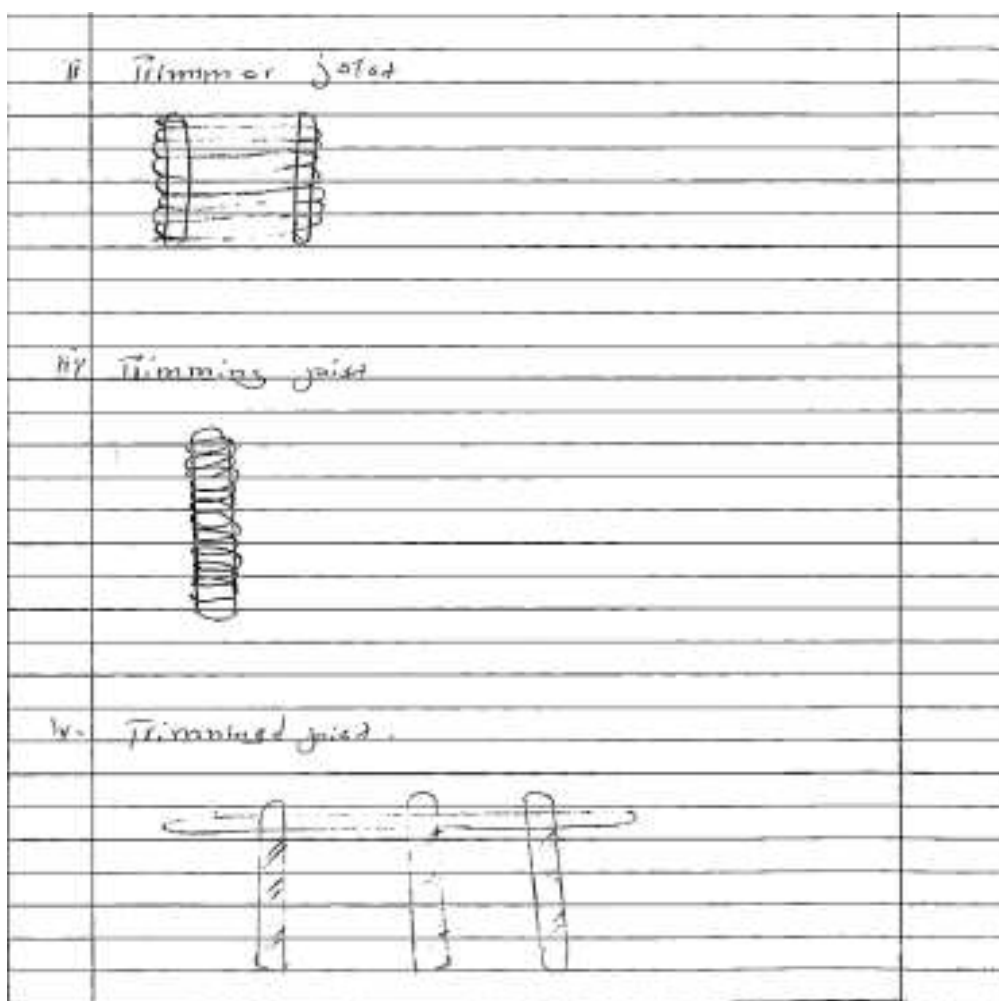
shows the frame of upper floor structure and show the given joist as asked in the exam.
